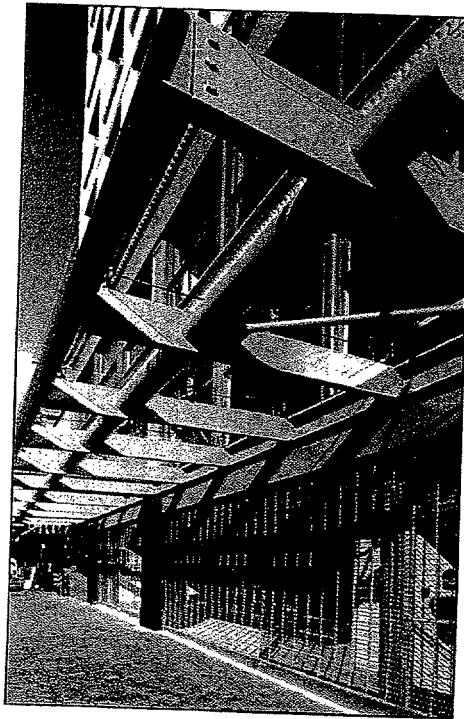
Judson Rives Building, 424 S. Broadway, Los Angeles, detail view of contemporary canopy added to historic building facade
